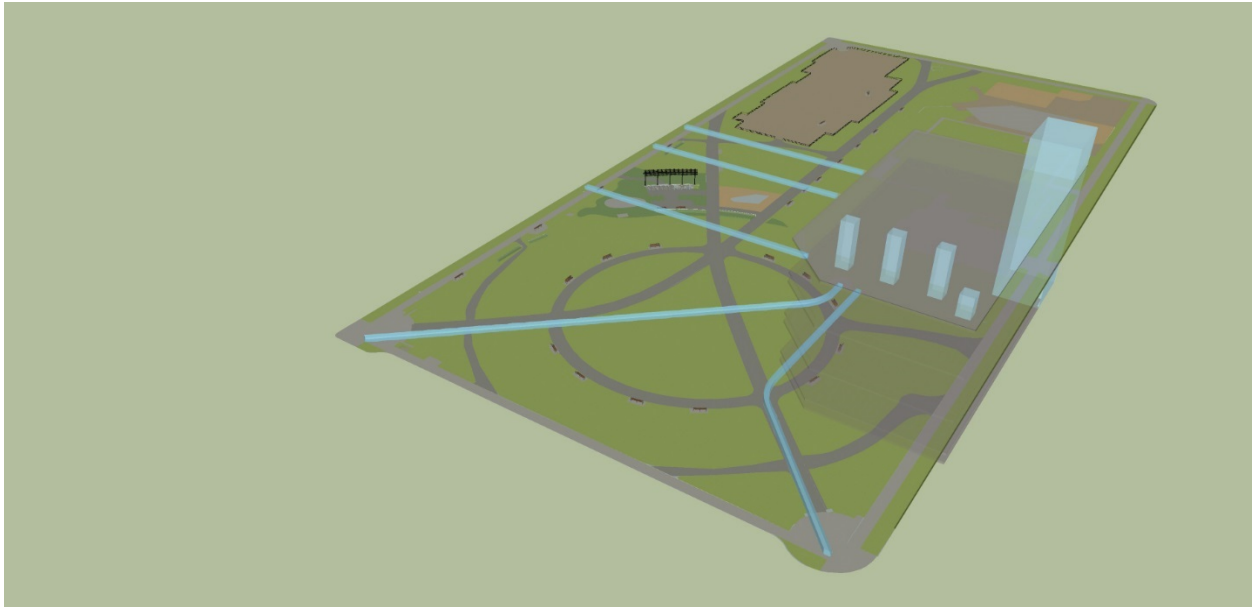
3D Rendering Image Showing Above Ground and Below Ground Infrastructure—Nelson Park
